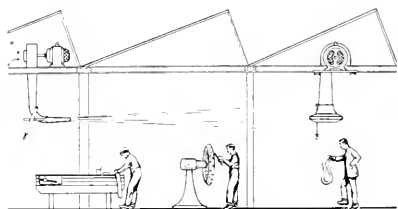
Side and front views of jet tubes as fitted up in a factory.
